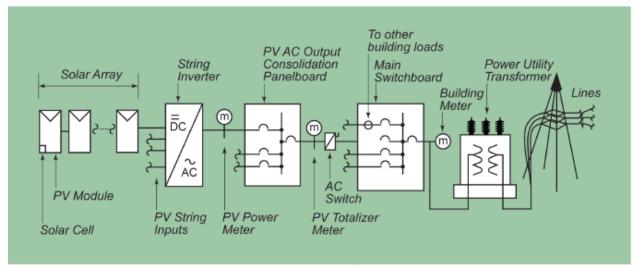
(RE1) Typical PV Single-Line Diagram
